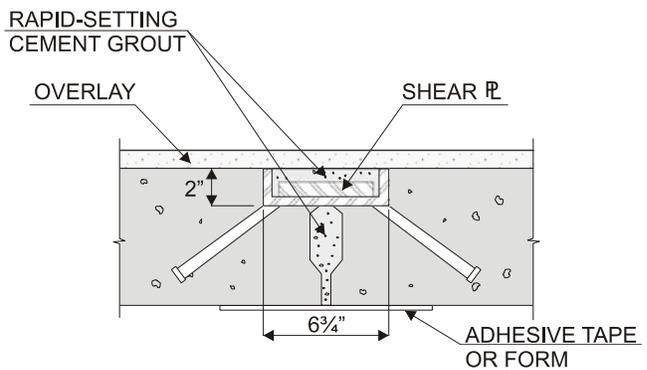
Welded sliding shear plates. [Source: Babaei et al. (1).]
